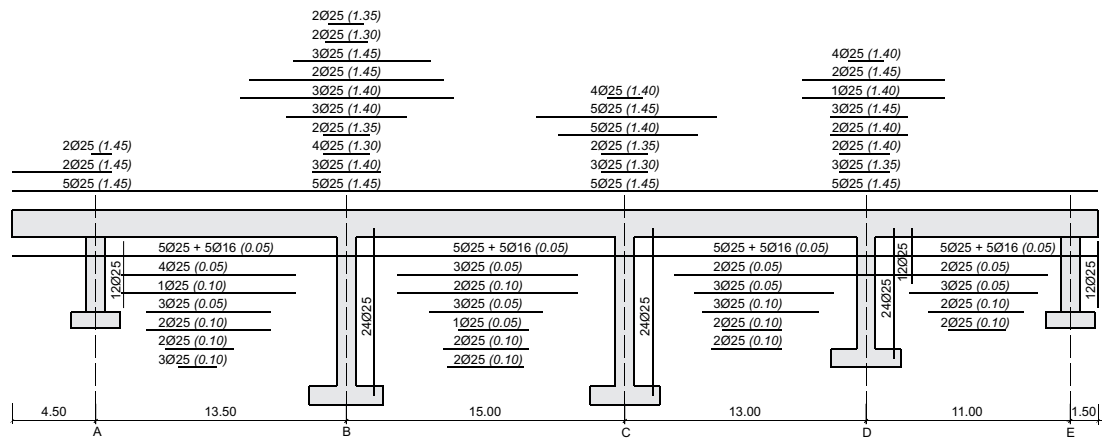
'Brunna Bridge' - outline of the longitudinal reinforcement (values in parenthesis are vertical location of reinforcement measured from the bottom of the girder).
